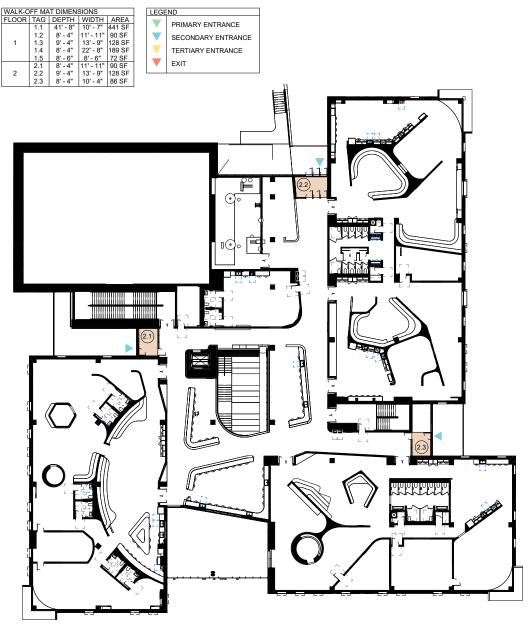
Healthy Indoor Environment - Second Floor Plan.
